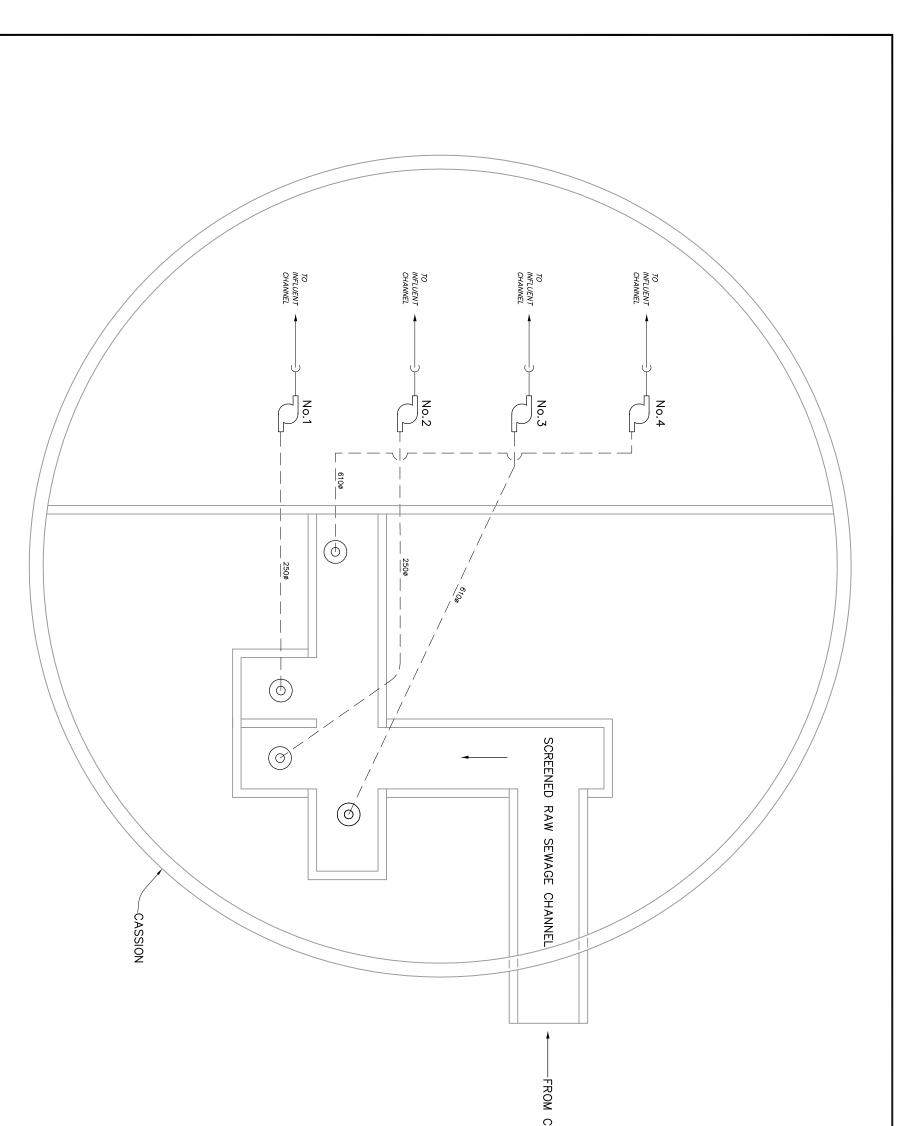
LIONS GATE WASTEWATER TREATMENT PLANT HEADWORKS INFLUENT PUMP SCHEMATIC
